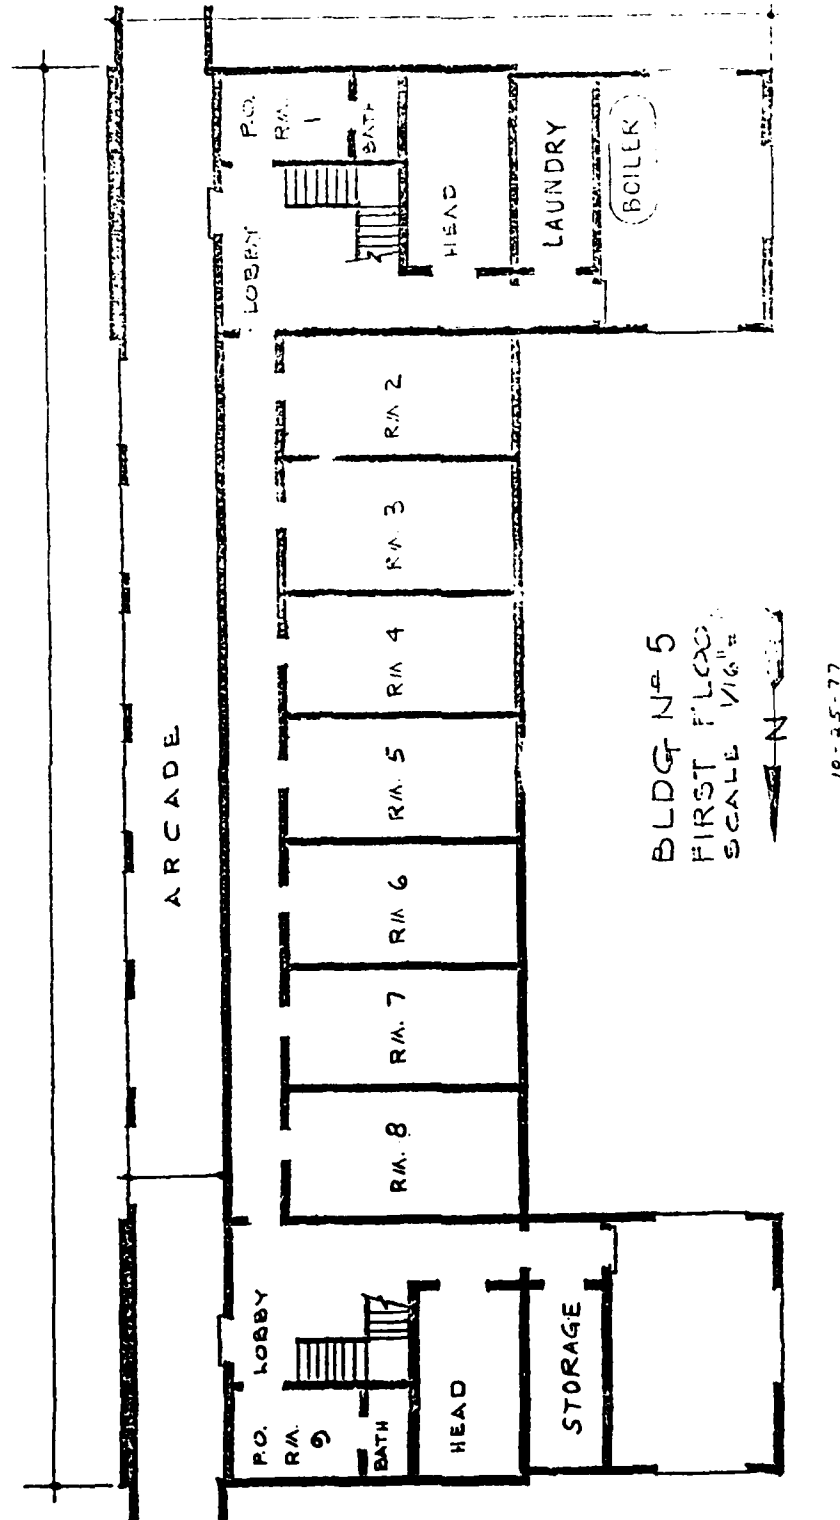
Overall First Floor Plan for Interior Corridor Design Barracks
